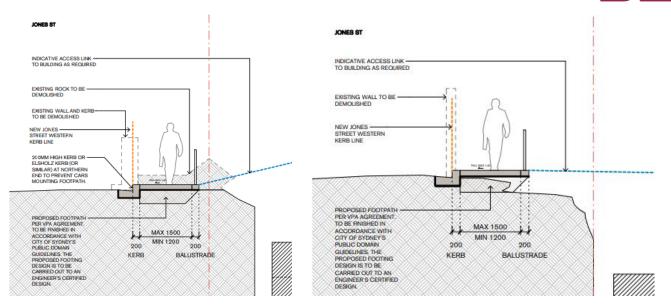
Extract of Public Domain Concept Plan Section 1 - Indicative Jones St Footpath (Source: Tzannes)
